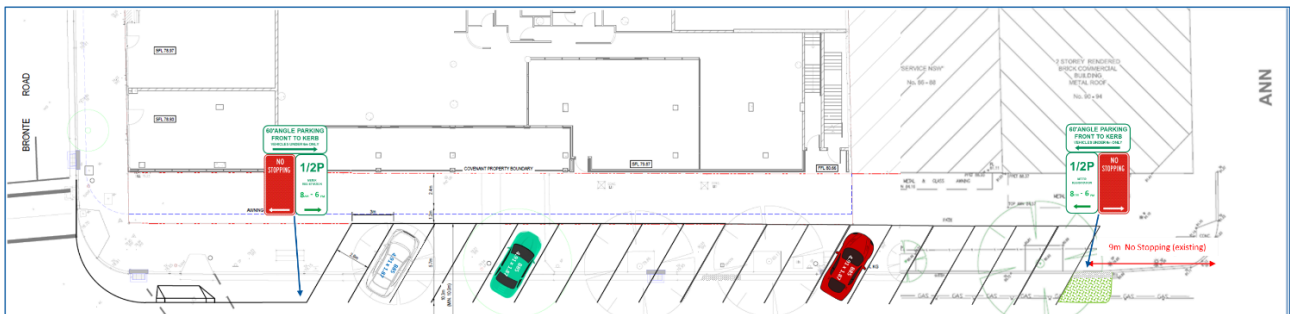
Proposed indented angle parking (note: the bays will not be delineated with line marking).
